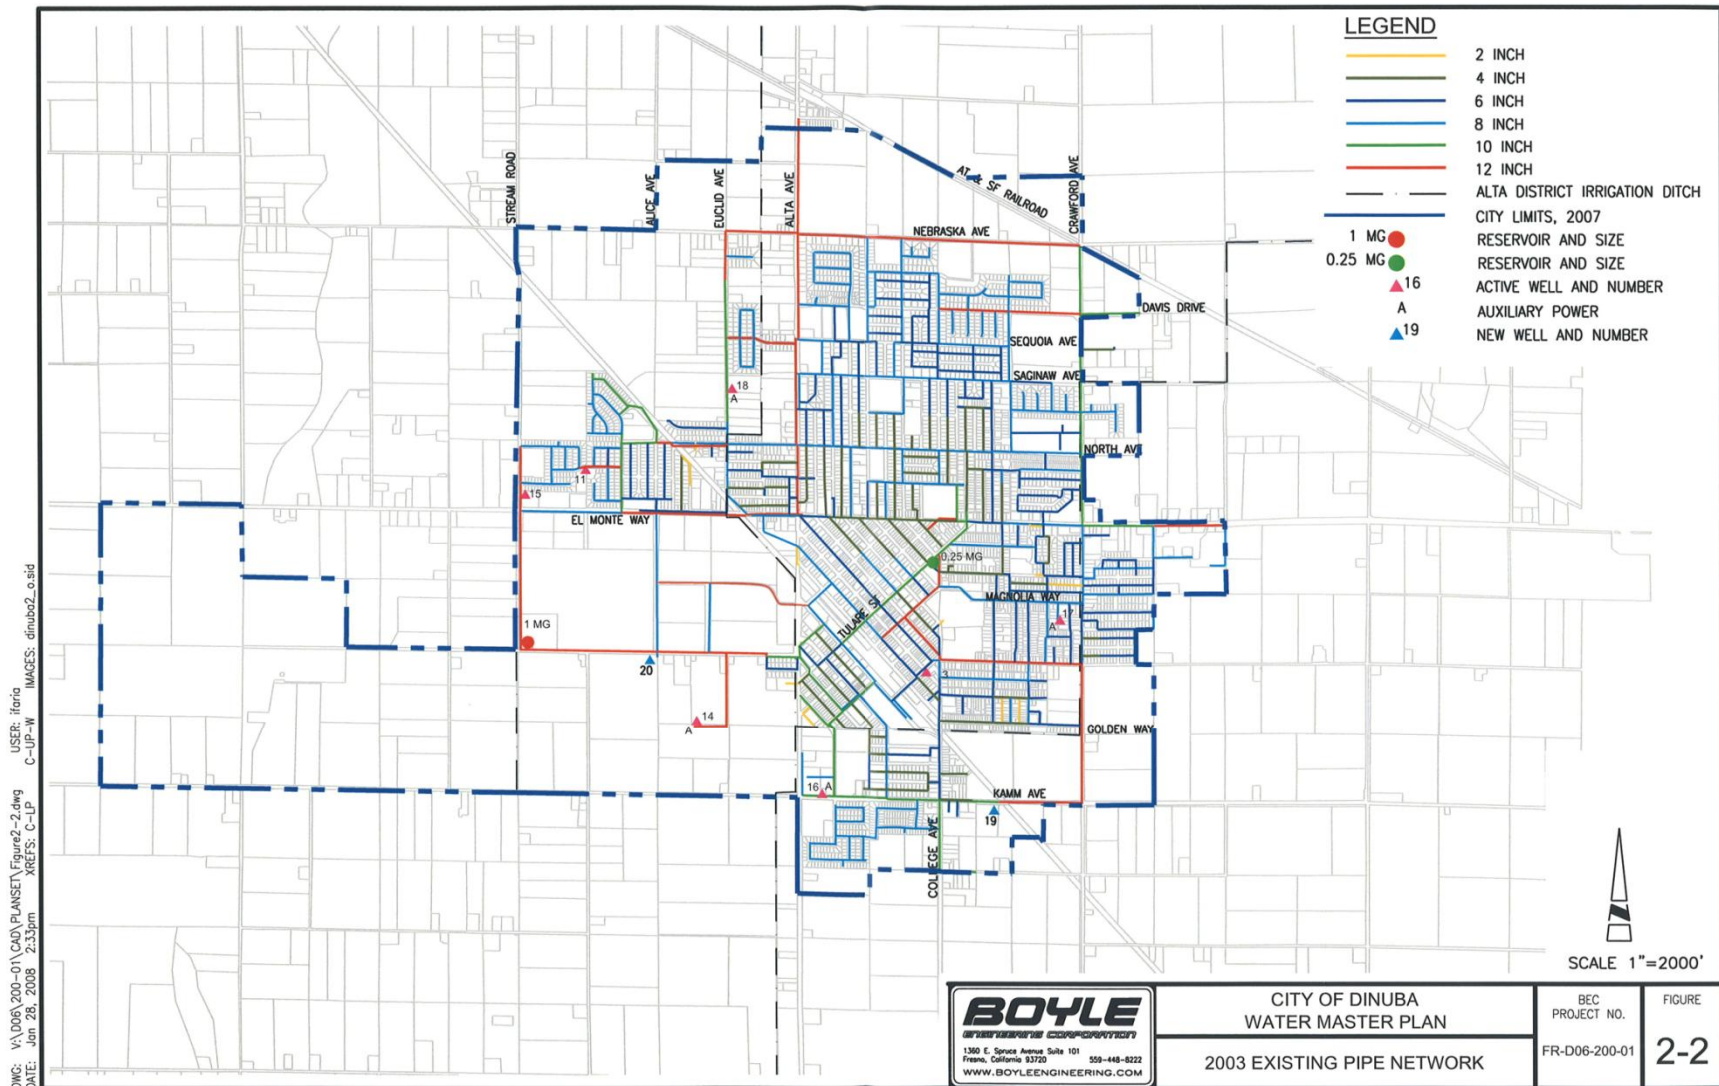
2003 Existing Pipe Network - Boyle 2008 Water Master Plan
